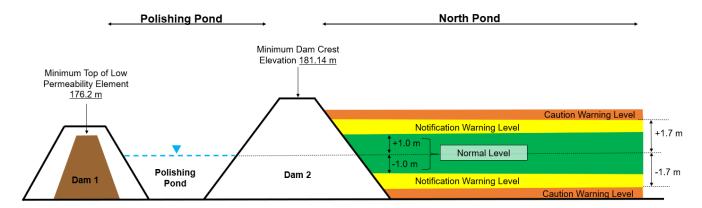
Water and Infrastructure Elevations Dam 2 / North Pond (not to scale)
